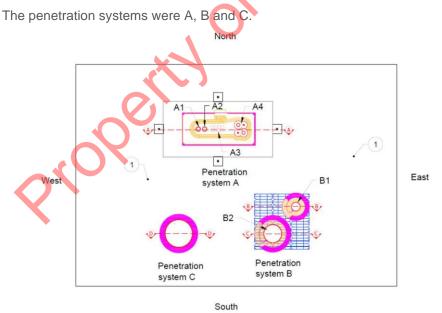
Plan view of the tested specimen from FRT200257 R1.0
